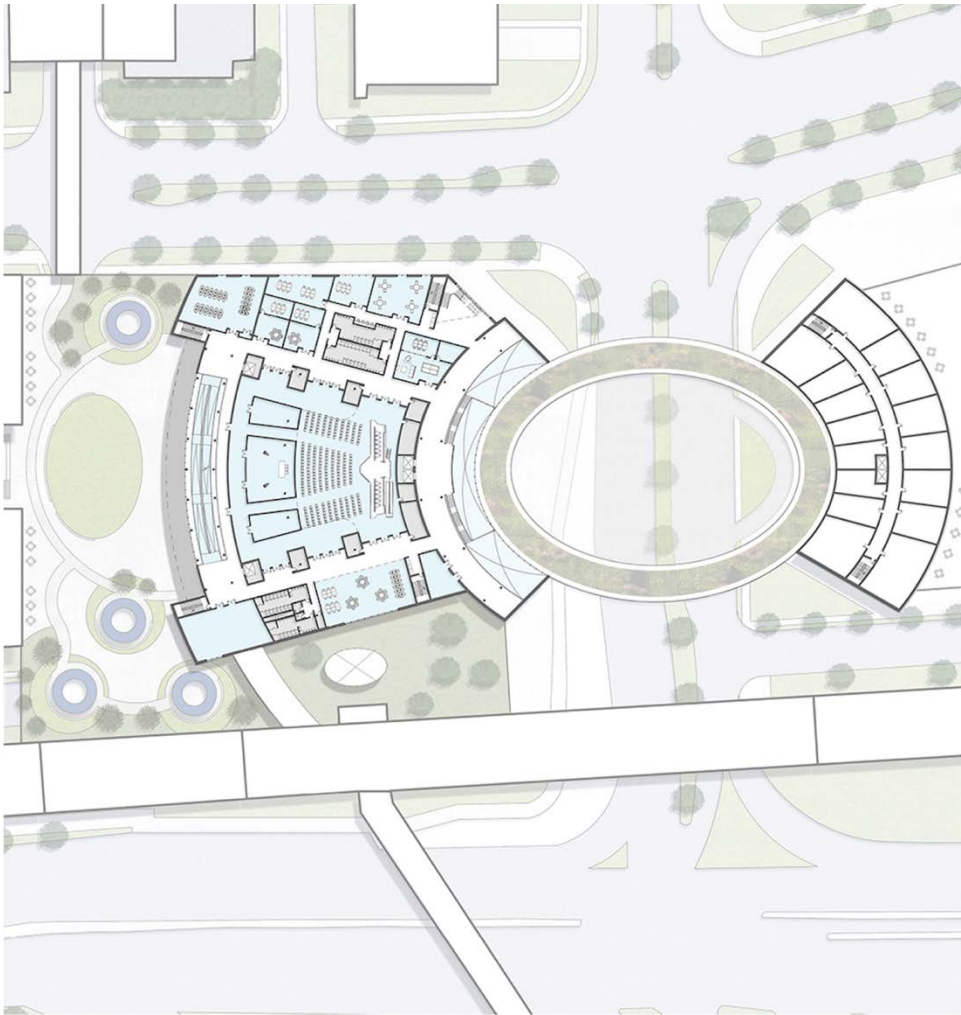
Fourth Floor Plan – Esports Arena Level (Source: Jefferson Choi)
